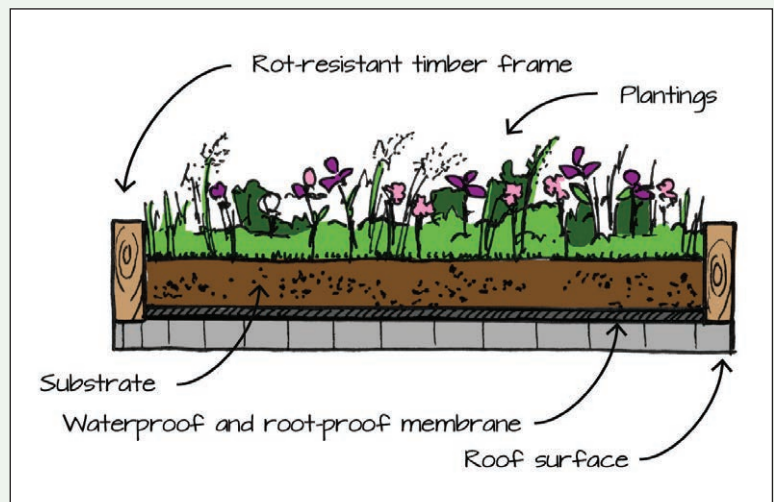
Typical layers of a green roof – make sure that any green roof project include a good waterproof membrane underneath the planting media.
